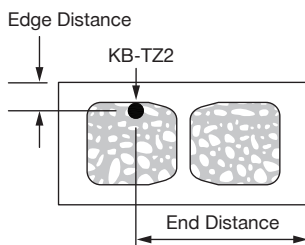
Acceptable locations (shaded areas) for Hilti KB-TZ2 anchors in the face of grout-filled CMU walls
